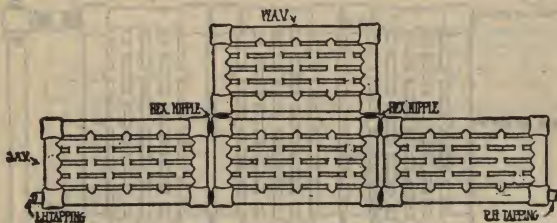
Horizontal. Four sections with two rows in center. Steam or water.
